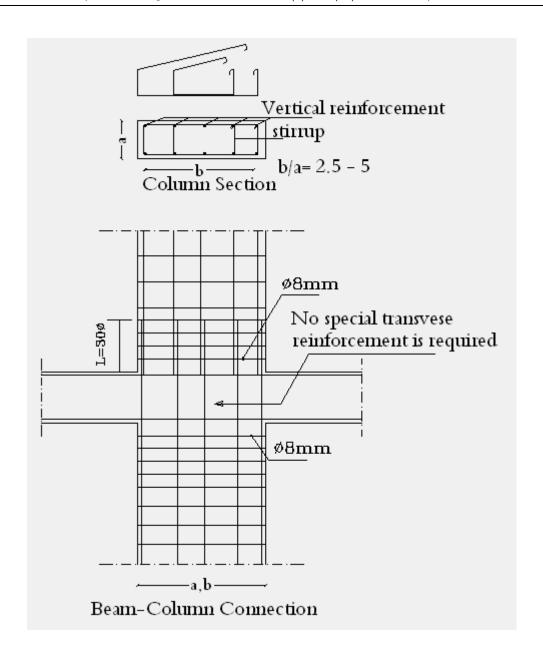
Critical Structural Details (Beam-Column Connection)
